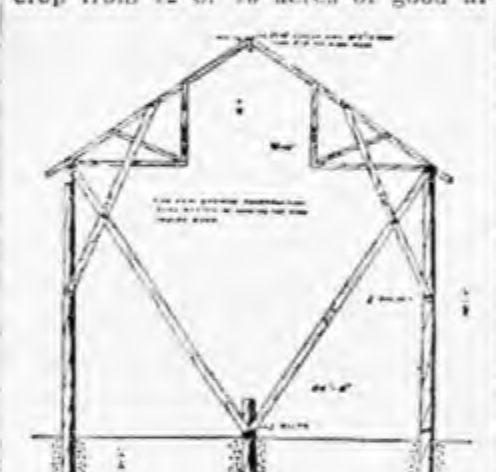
Showing Plan of Construction of End Section, General Plan of Bracing for Middle Sections.
